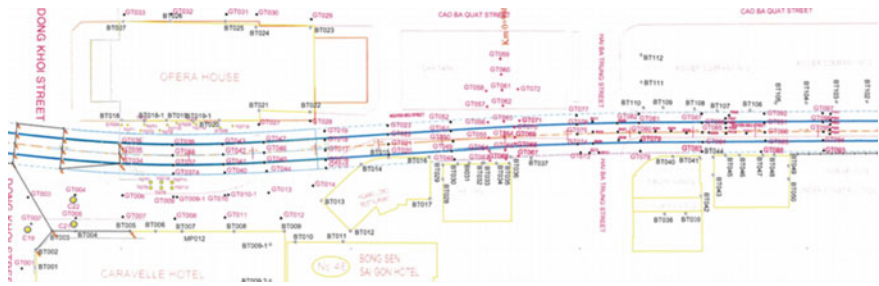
Surface settlement monitoring layout near the Opera House station [8]
